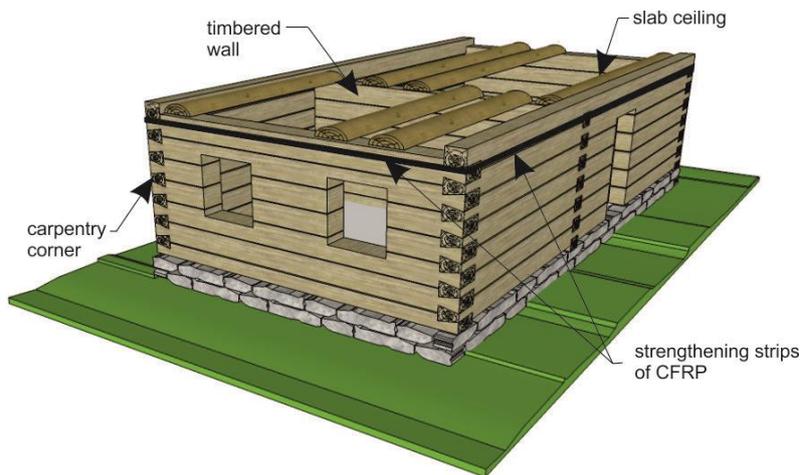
Securing the spatial rigidity of a timbered construction by a reinforcing collar beam at the floor construction level
